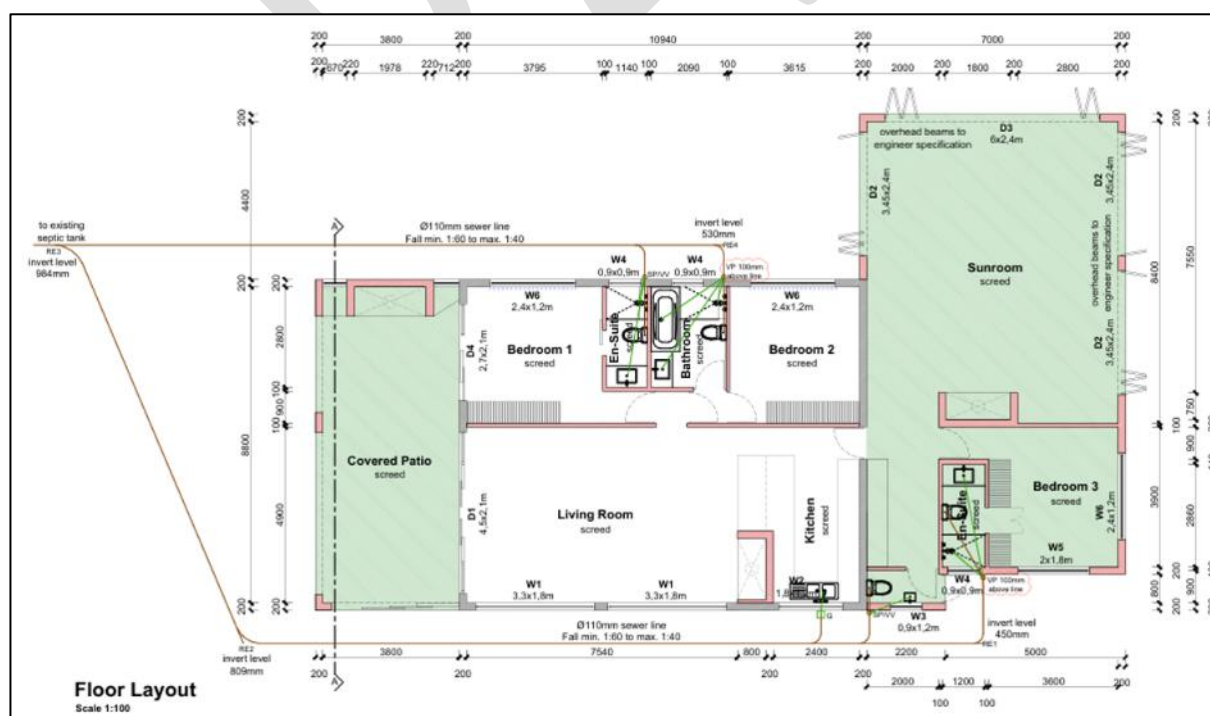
Floor plan for the proposed development (extension to building 3) provided by EcoRoute Environmental Consultants. New additions are shaded in green.
